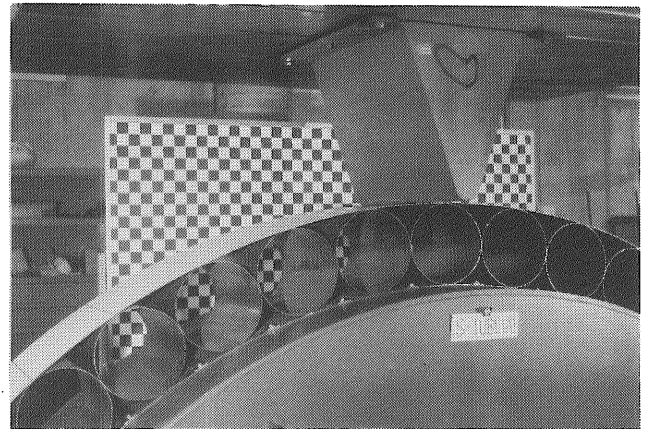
Tube type of buffer on the loading condition (A) [S - TUBE (A)]
